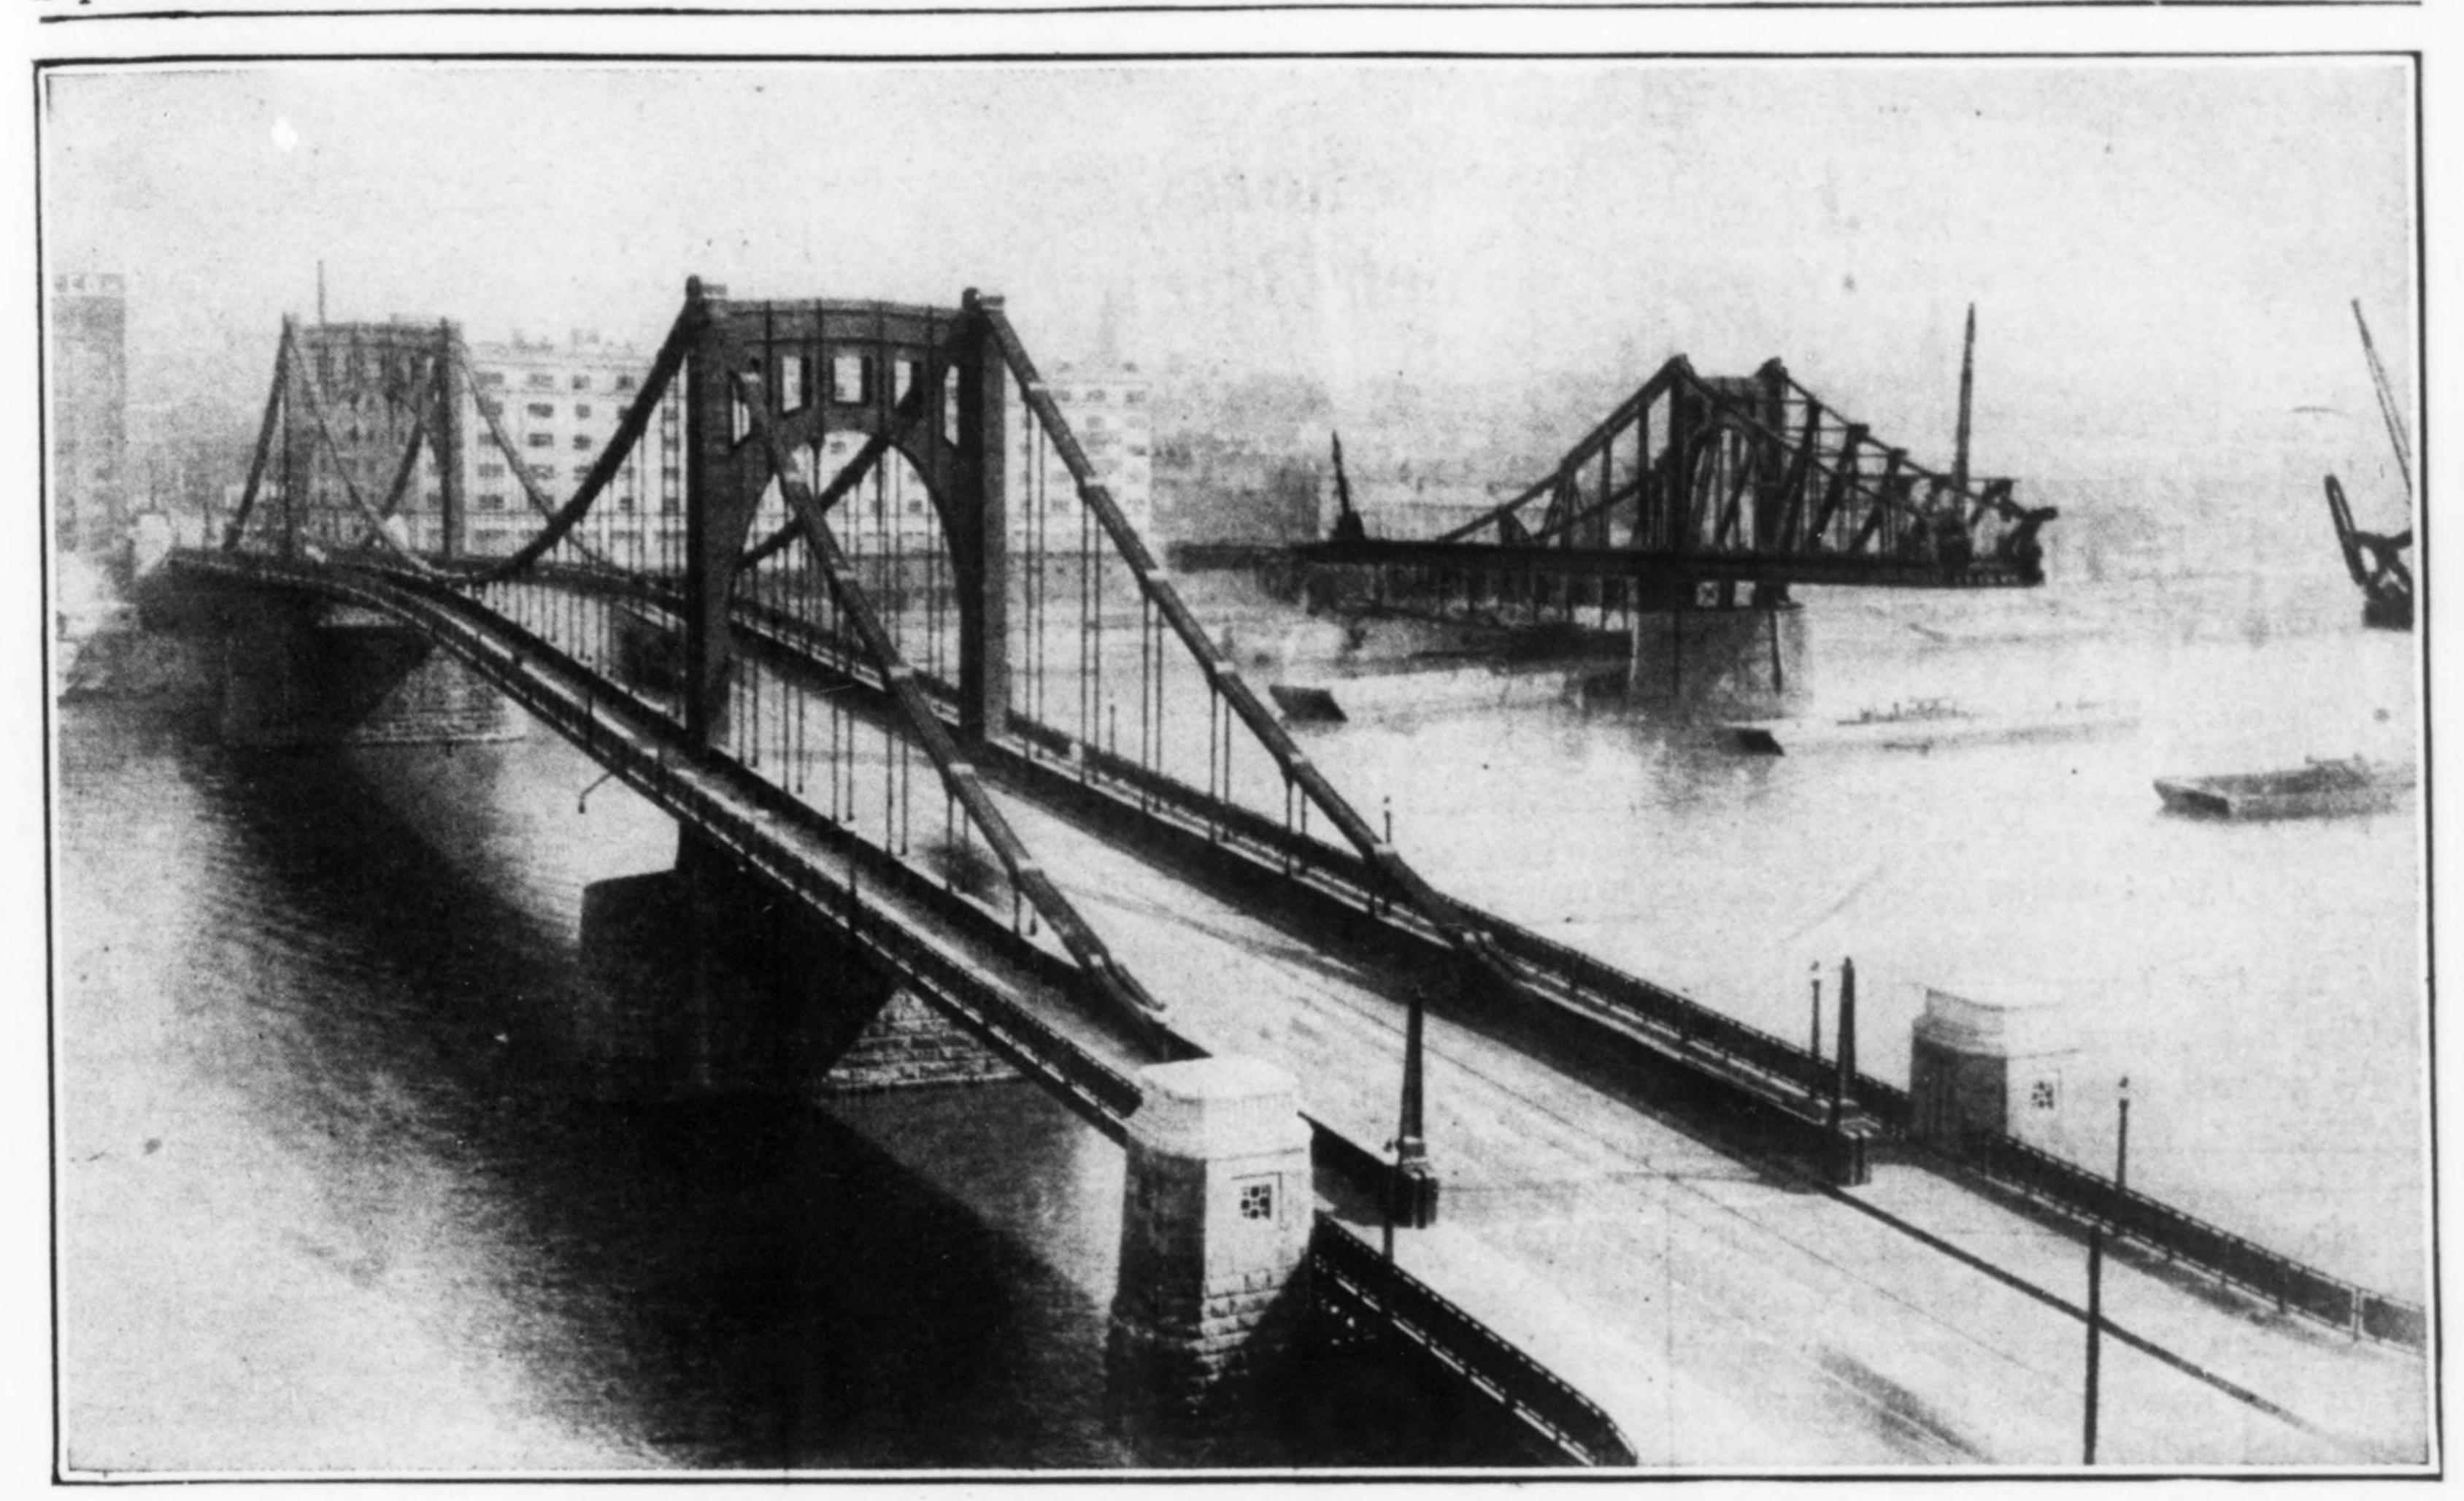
SEVENTH ST. BRIDGE AT PITTSBURGH, COMPLETED
